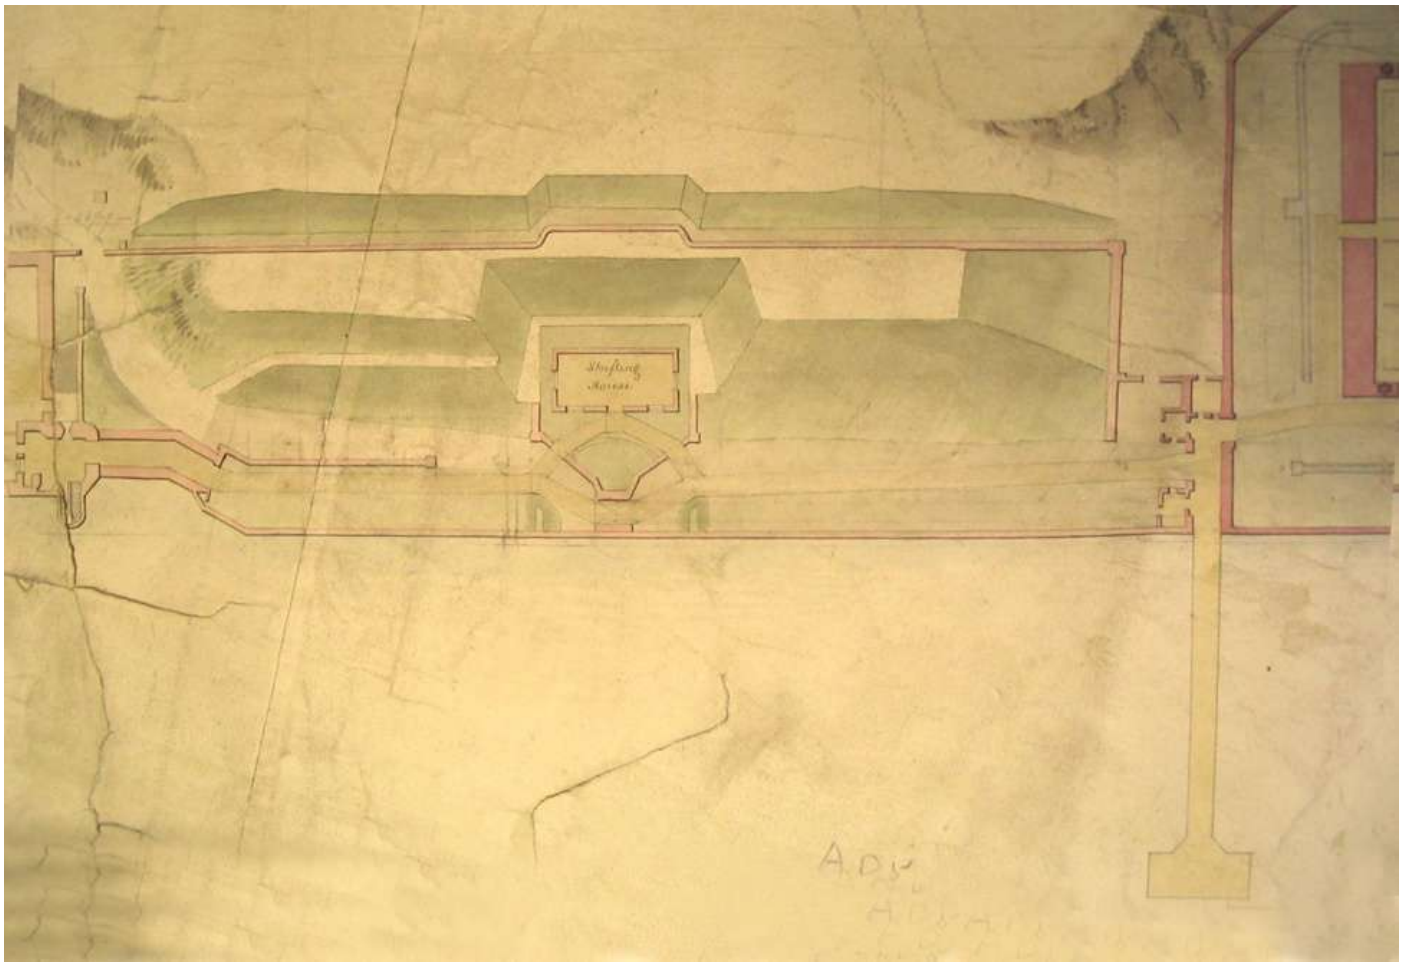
The Shifting Room was a brick building (Evans 2000b: 30)
